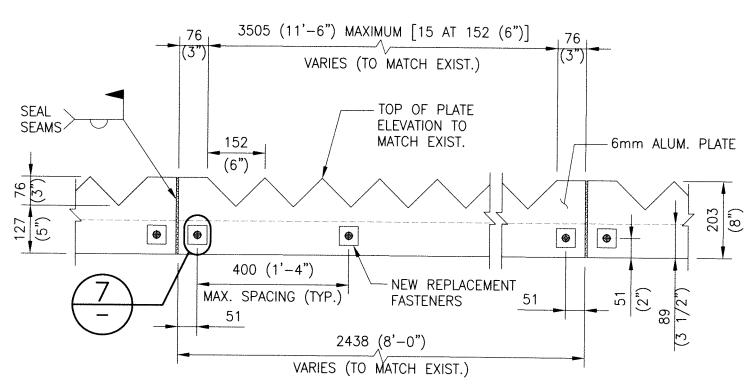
DETAIL — WEAR PLATE CORNER PORTION OF WALL (EXIST.)
